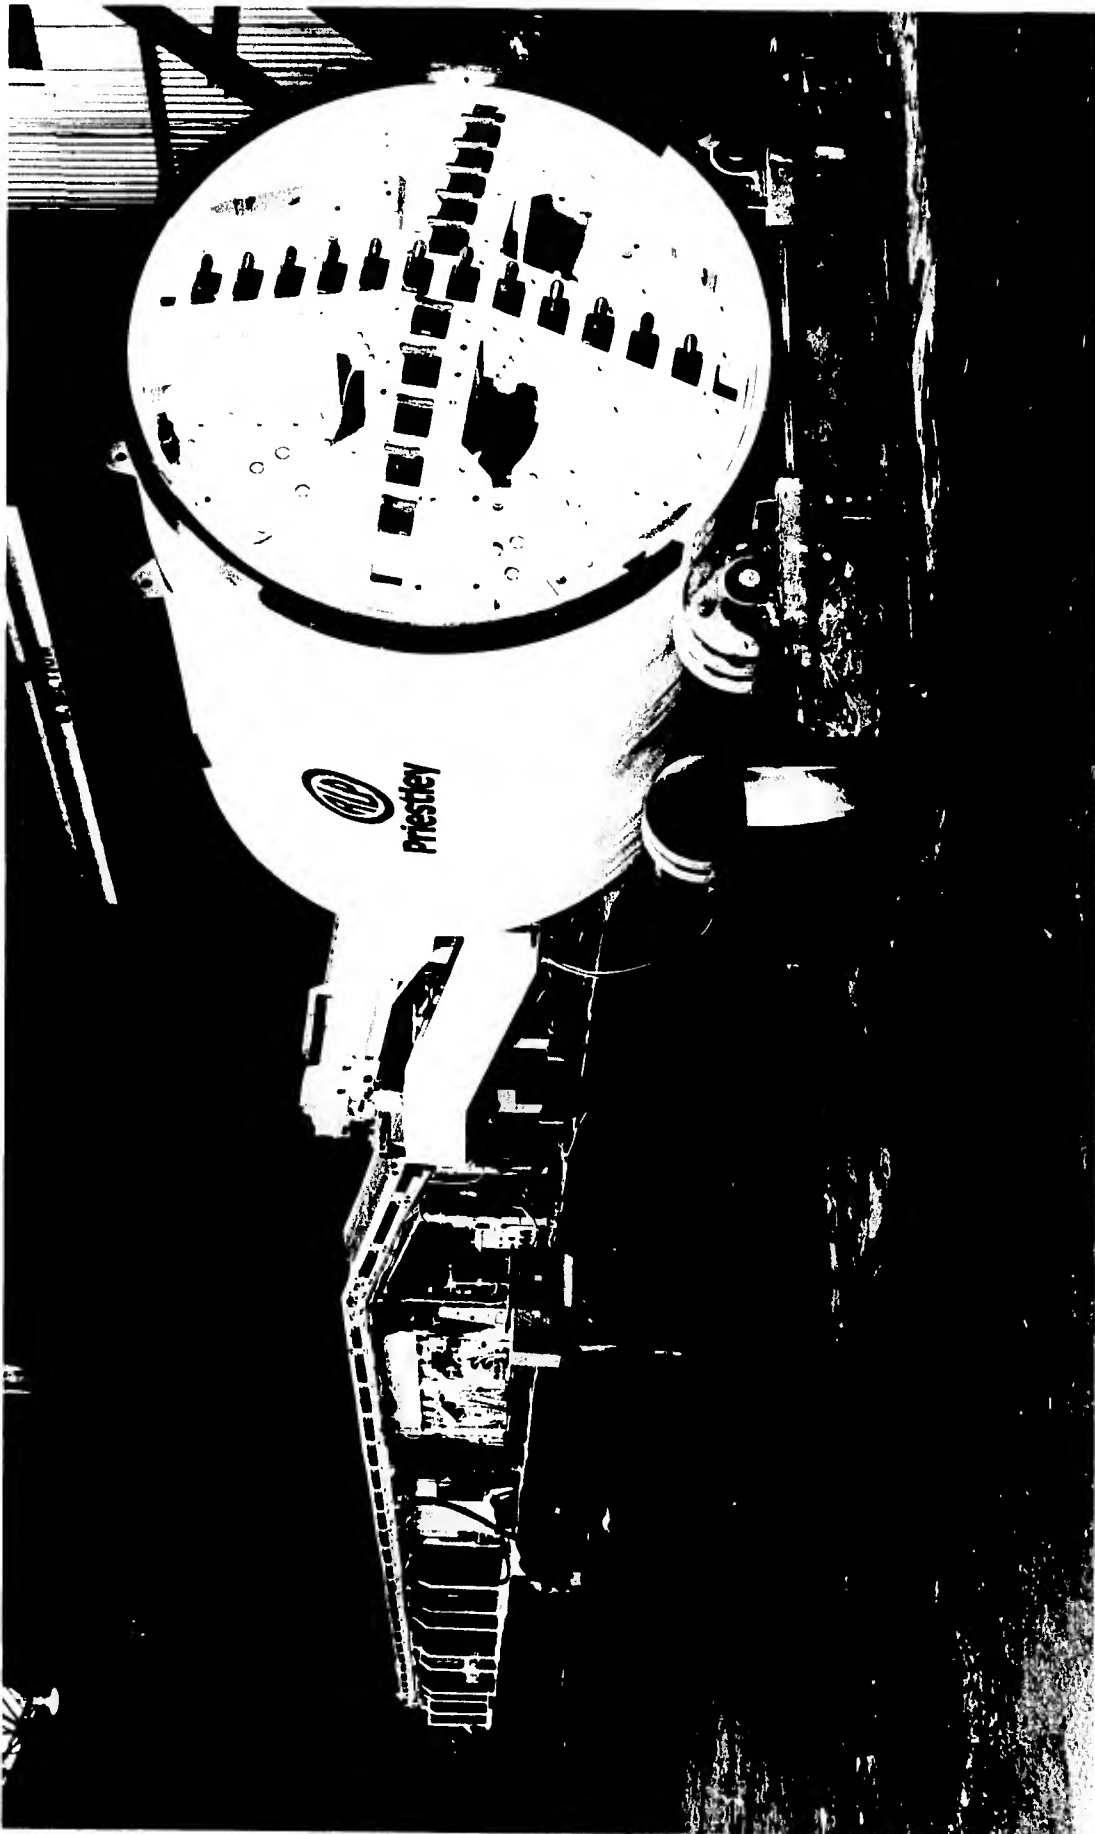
Modern full face tunnel boring machine for soft ground tunnels; note full telescopic shield for support of tunnel. Segmental lining may be erected safely inside this shield, and grouted in place as the machine advances (courtesy of Robert Priestly Ltd)
